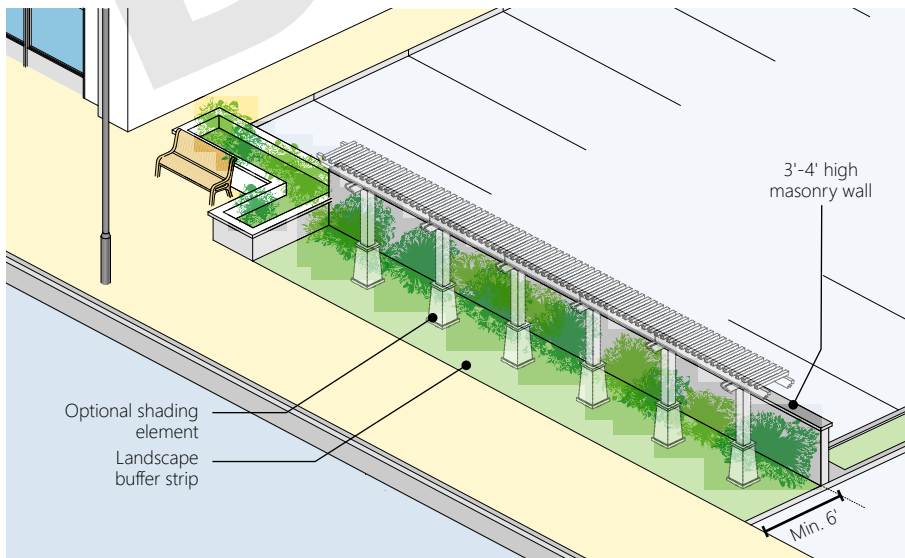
Surface parking areas shall be screened from sidewalks and public streets using a landscape buffer strip.
